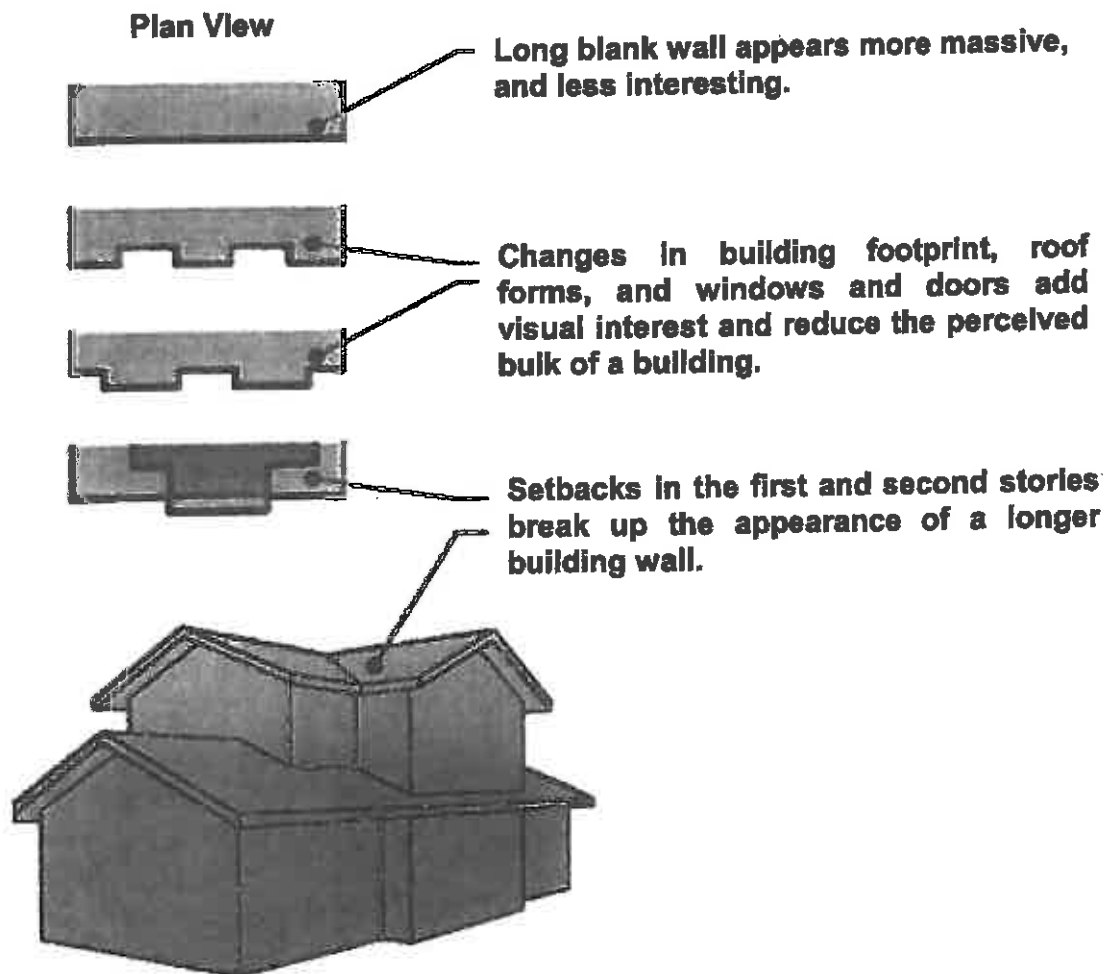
The appearance of the home shown above is visually interesting due to its articulated building walls and roof forms. Substantial window framing, textured exterior walls, divided light windows, and material variation (i.e., a stone base with horizontal siding) could be used to further complement the design of this home.
